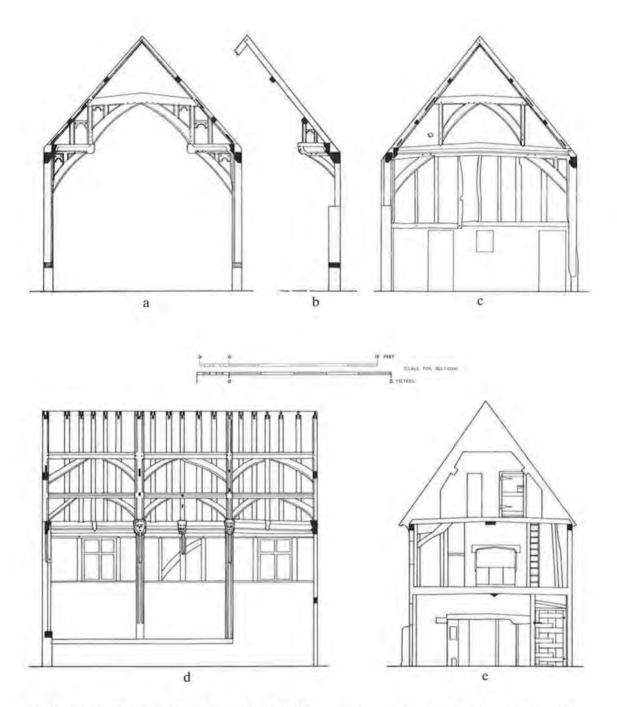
Rectory Cottages, Bletchley: sections. (a) Hall, western hammer-beam truss, with cornice restored on S side. (b) Hall, intermediate hammer beam. (c) Hall, eastern truss, looking east, showing mortice for missing cornice. (d) Hall, long section, looking north. (e) Cross wing, looking south.
